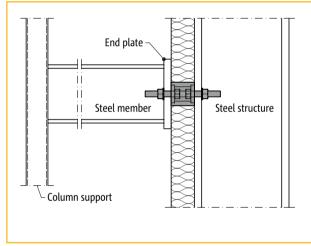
Schöck Isokorb® type S22 for supported steel structures
